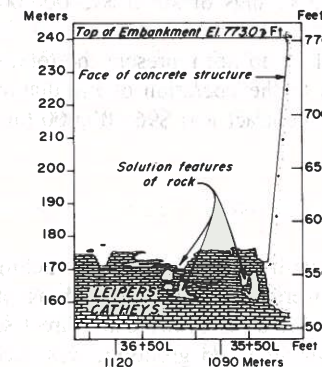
Section along Diaphragm Wall Alignment Showing Solution Features of Bedrock
